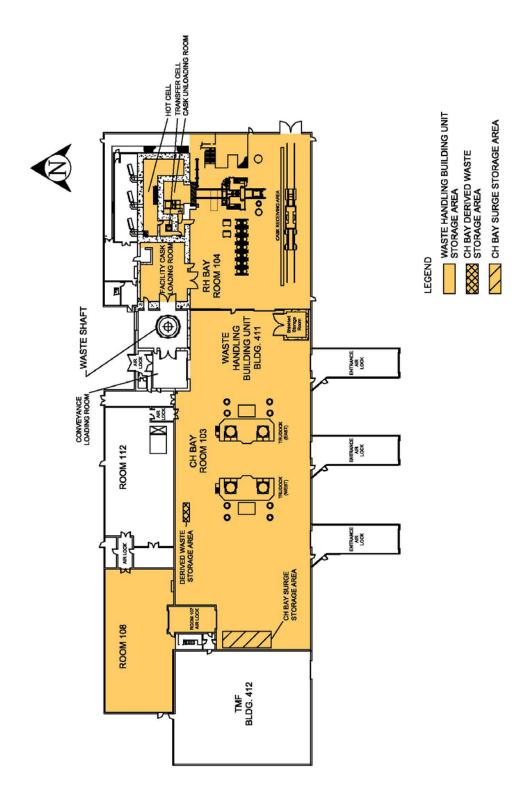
Waste Handling Building Unit – TRU Mixed Waste Container Storage and Surge Areas
